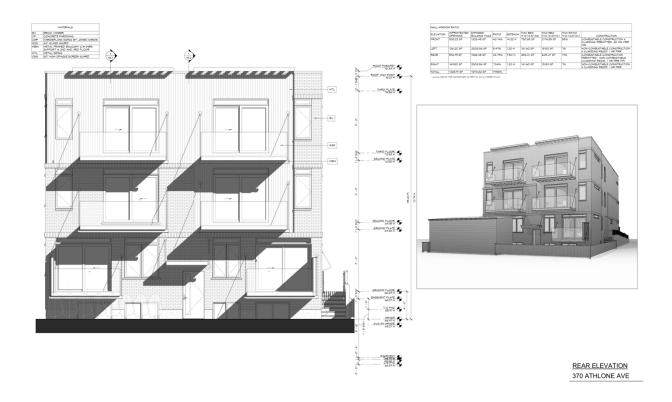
Rear Elevation of Proposed Building (Source: Grant Henley Design Group)
